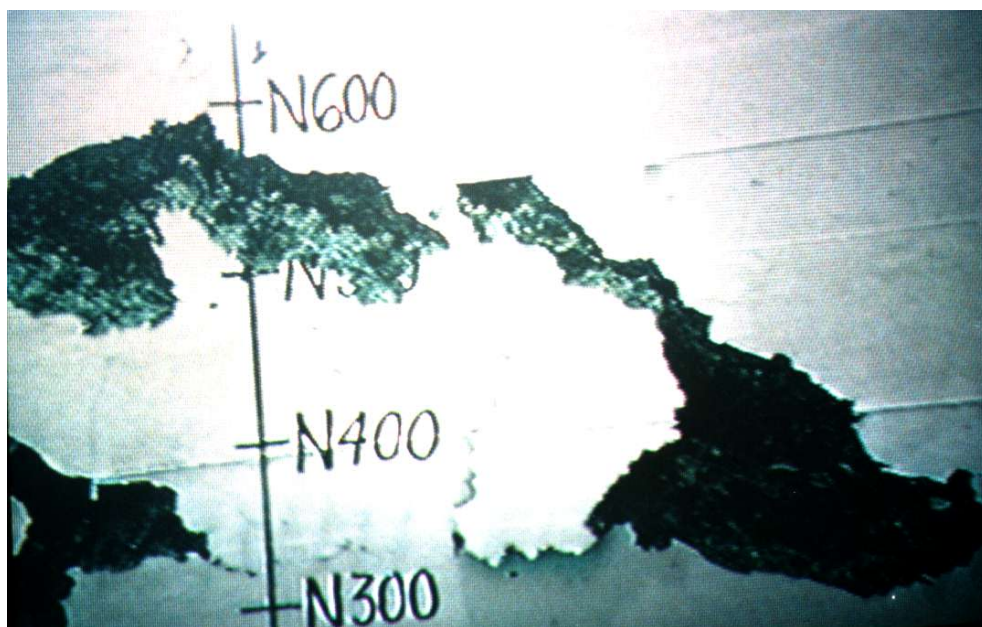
Failure of Inside Face Concrete at Ductility 4.0
